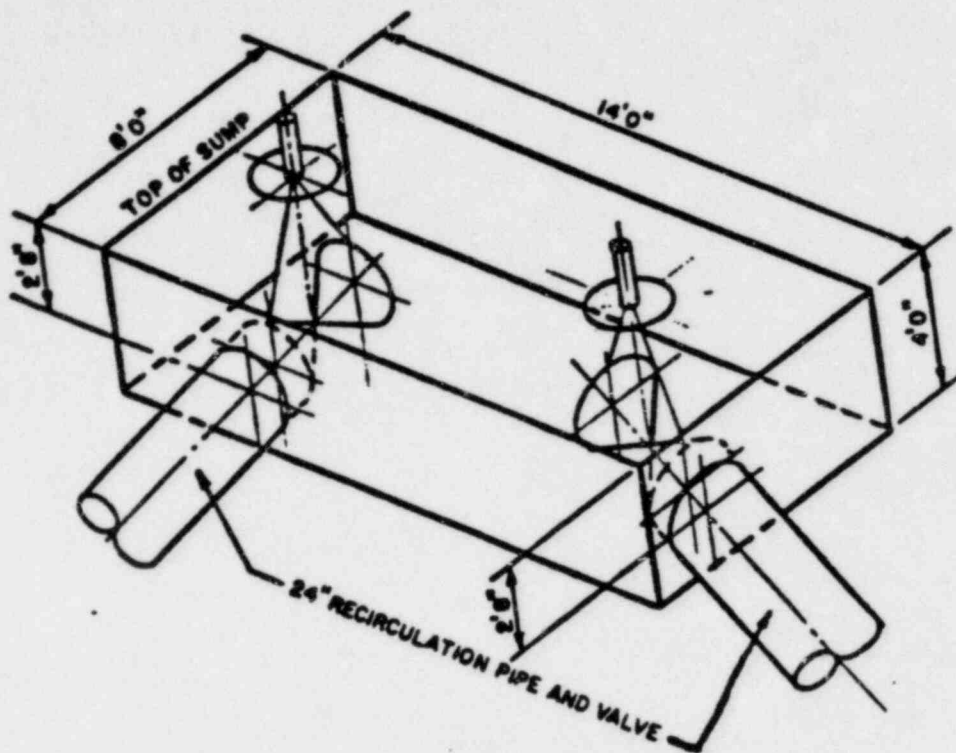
ECCS Sump and Containment Building Layout, Oconee Unit 3
